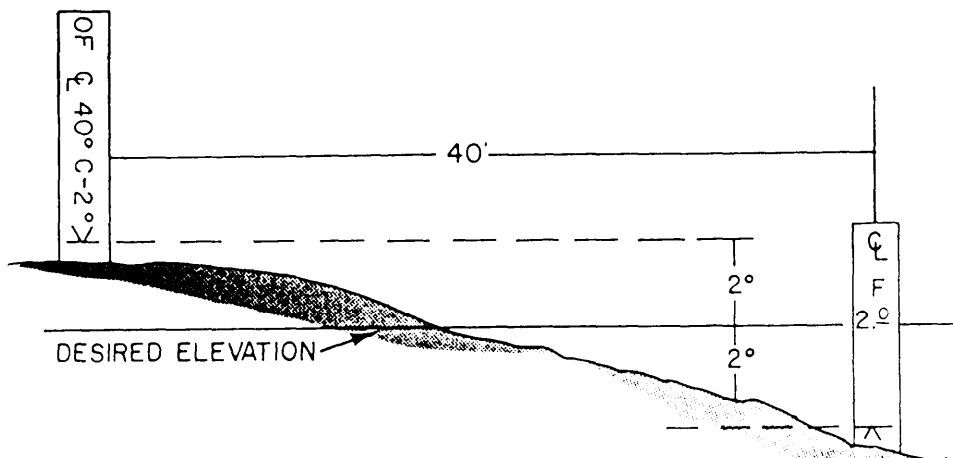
Difference in elevation between the offset stake crowfoot and desired grade at center stake.
